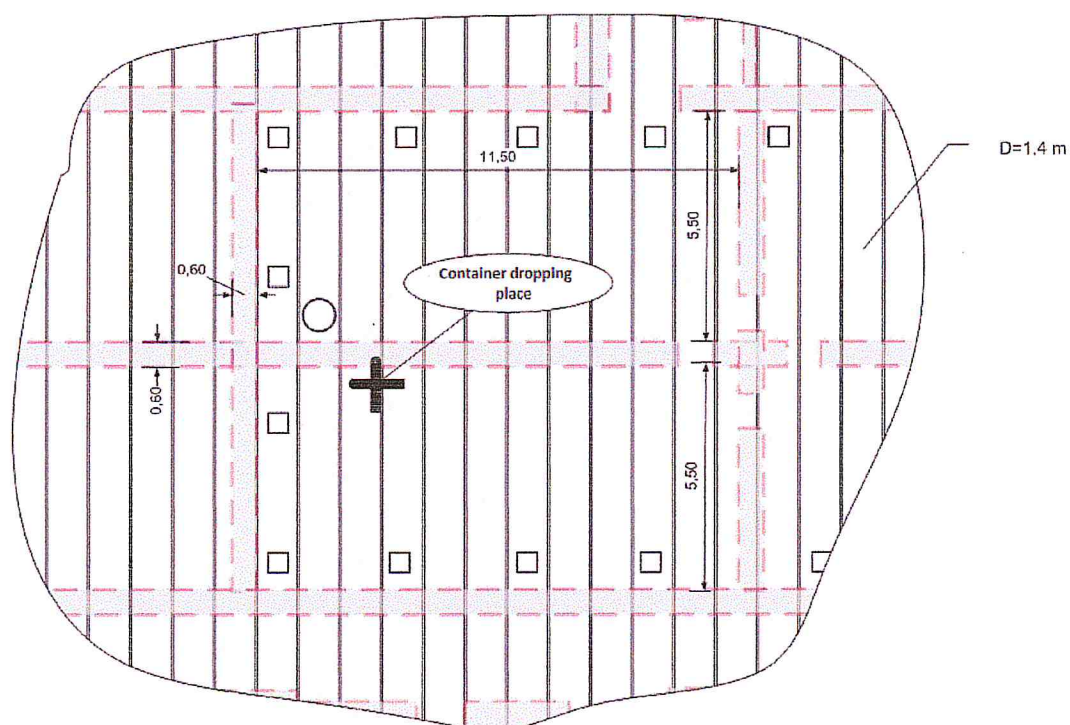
Parameters of test hall power floor site in container dropping place.
